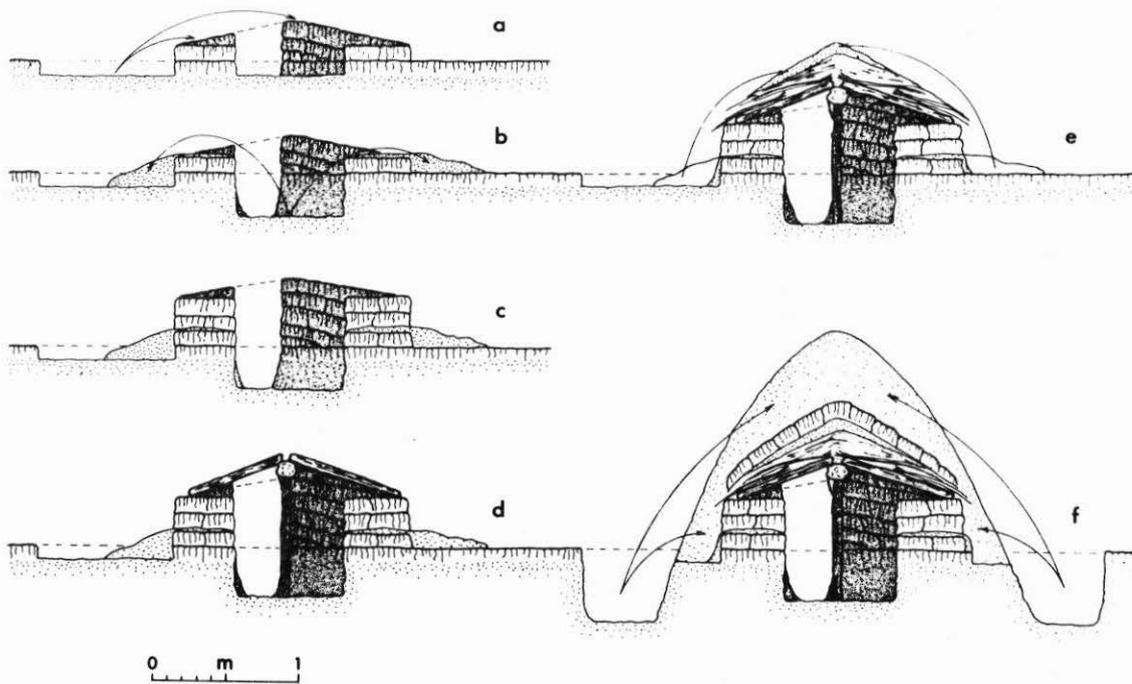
Cross-sections of stages of construction of raised rim kumara storage pit.
